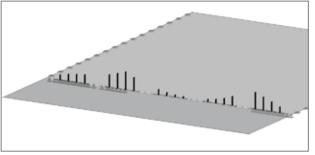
Schöck Isokorb® T type K-E, K-T: 3D view of uneven shear force distribution; the floor only supports the balcony at the ends, in-between the floor hangs on the balcony
